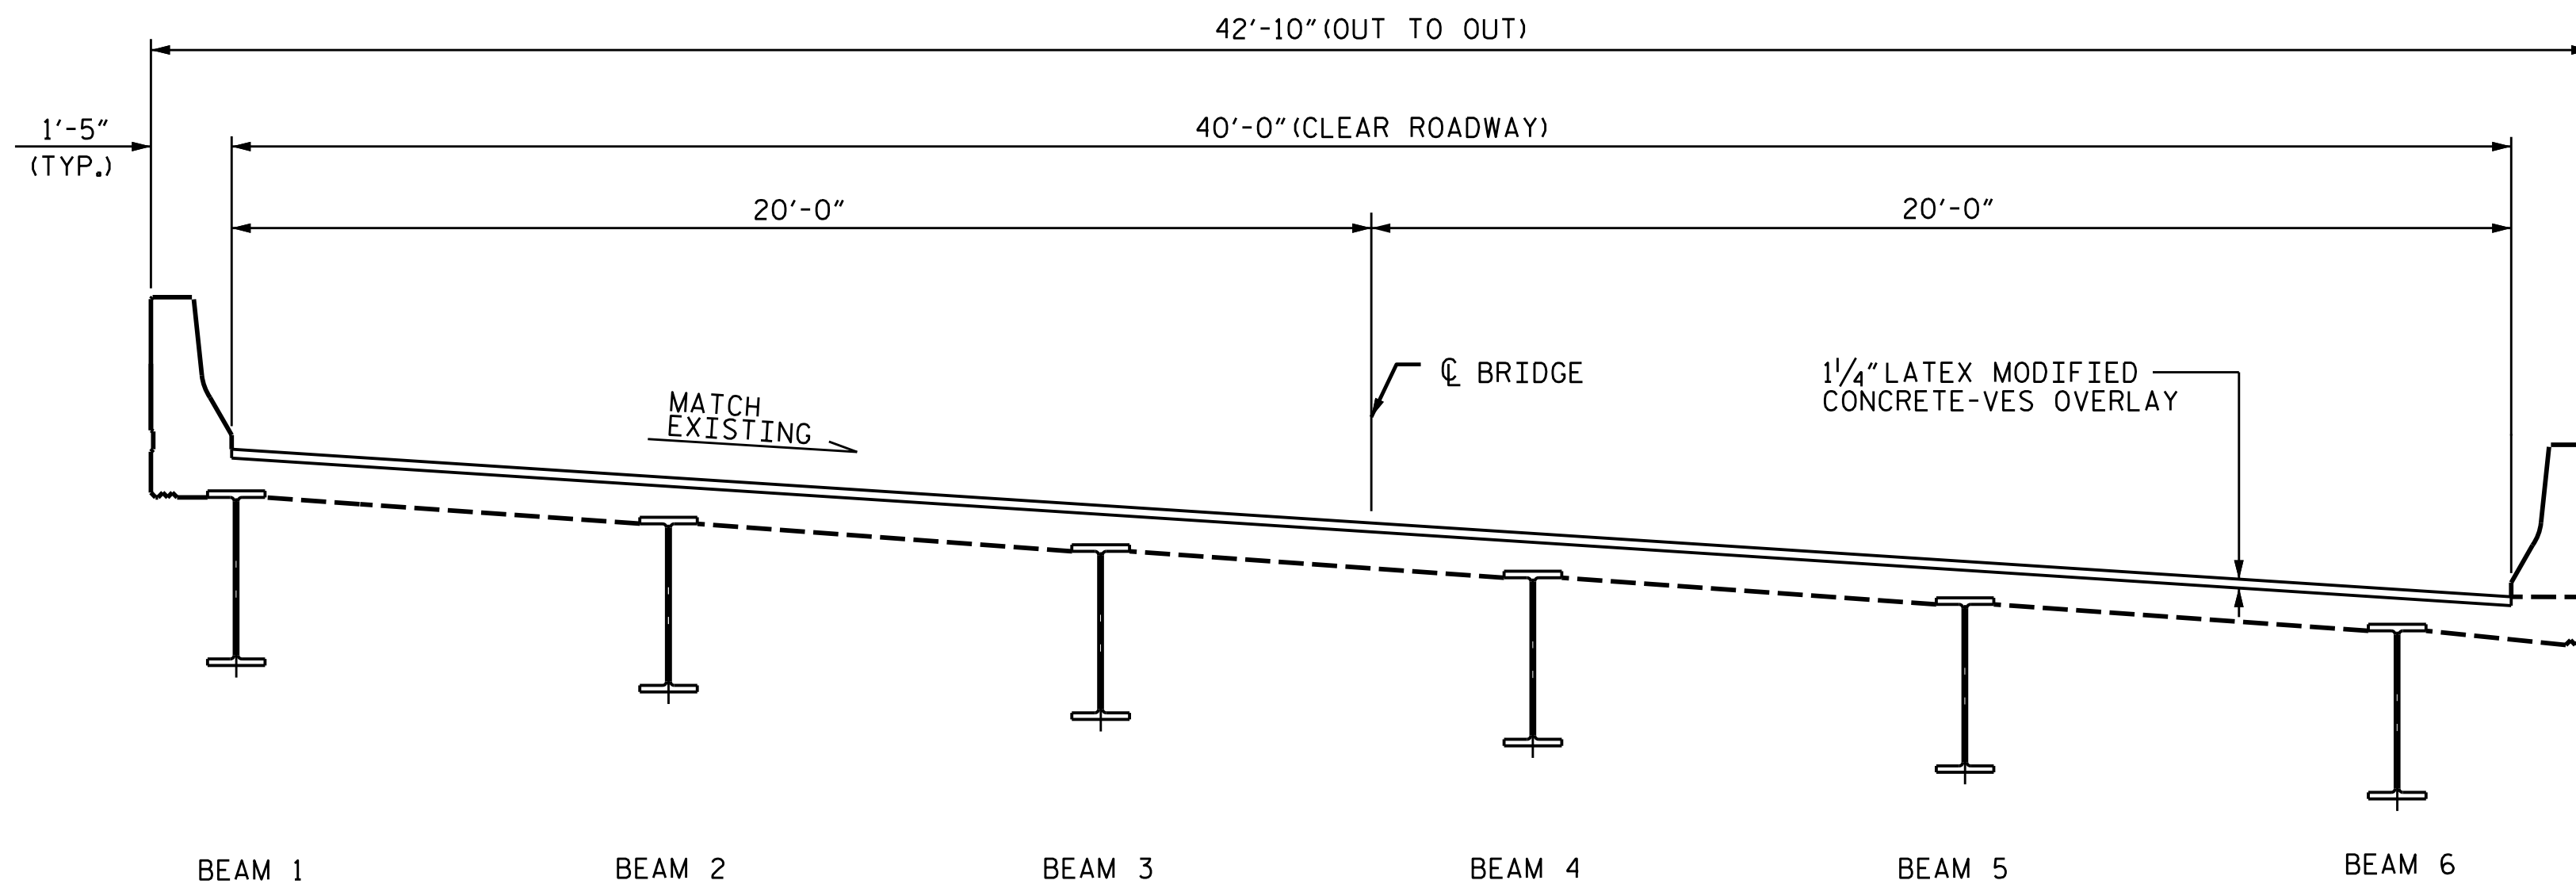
DETAIL FOR LATEX MODIFIED CONCRETE-VES OVERLAY
